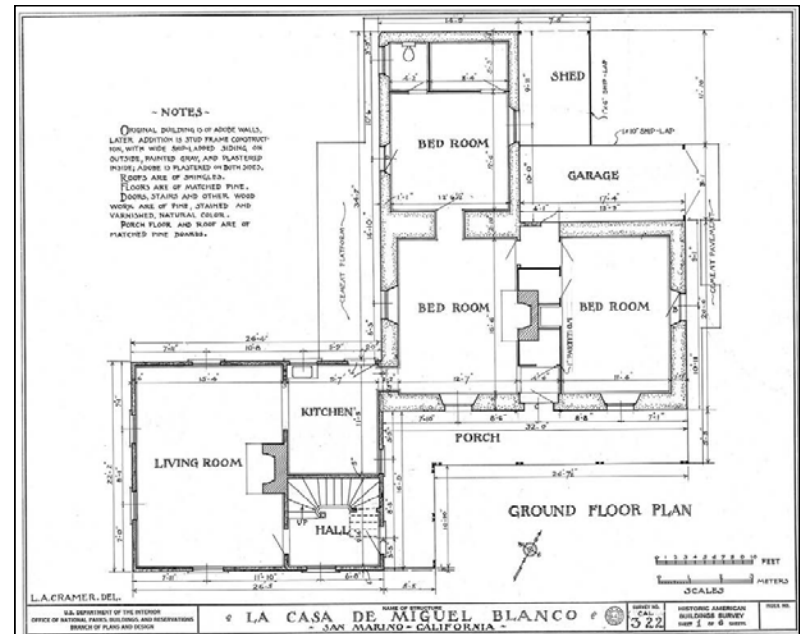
Drawing of "Ground Floor Plan" (Historic American Building Survey, 1936)
